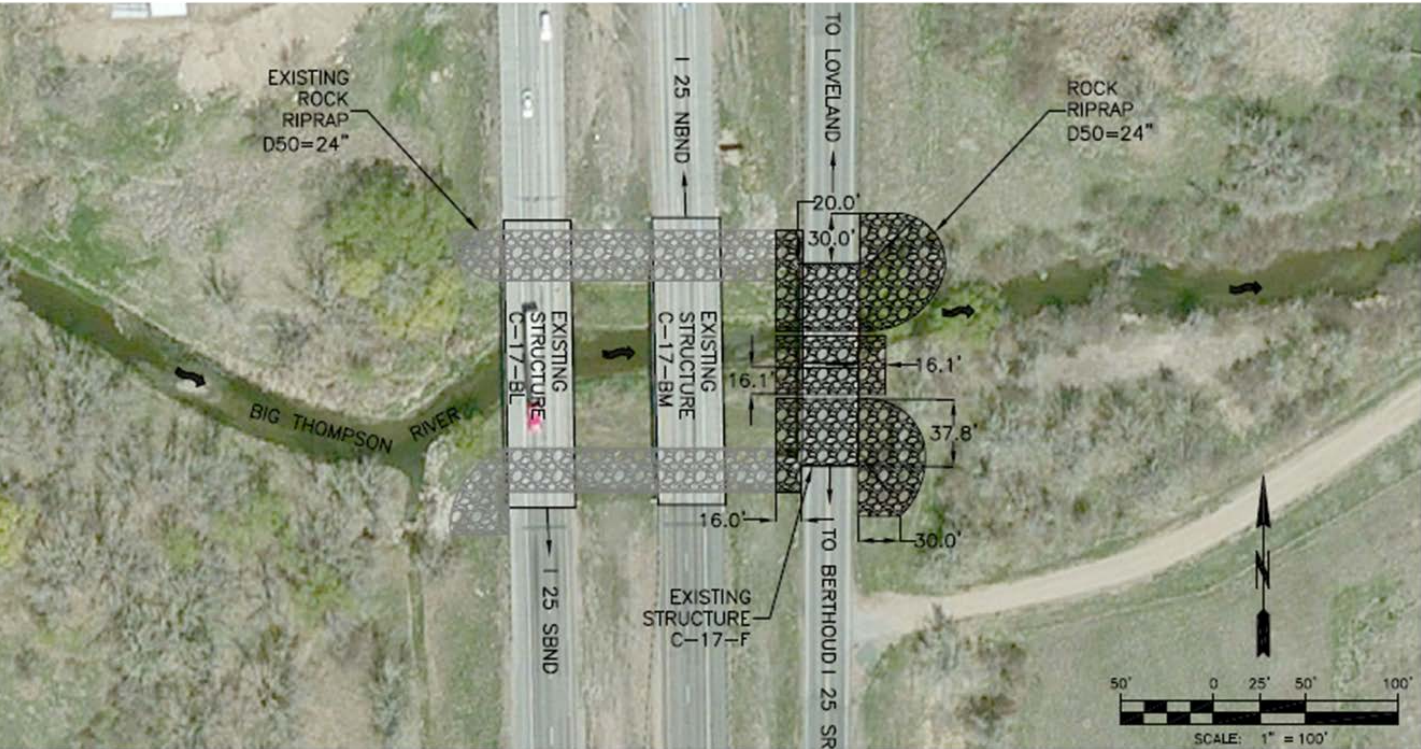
Plan view of Bridge C-17-F with recommended hydraulic scour countermeasure locations
